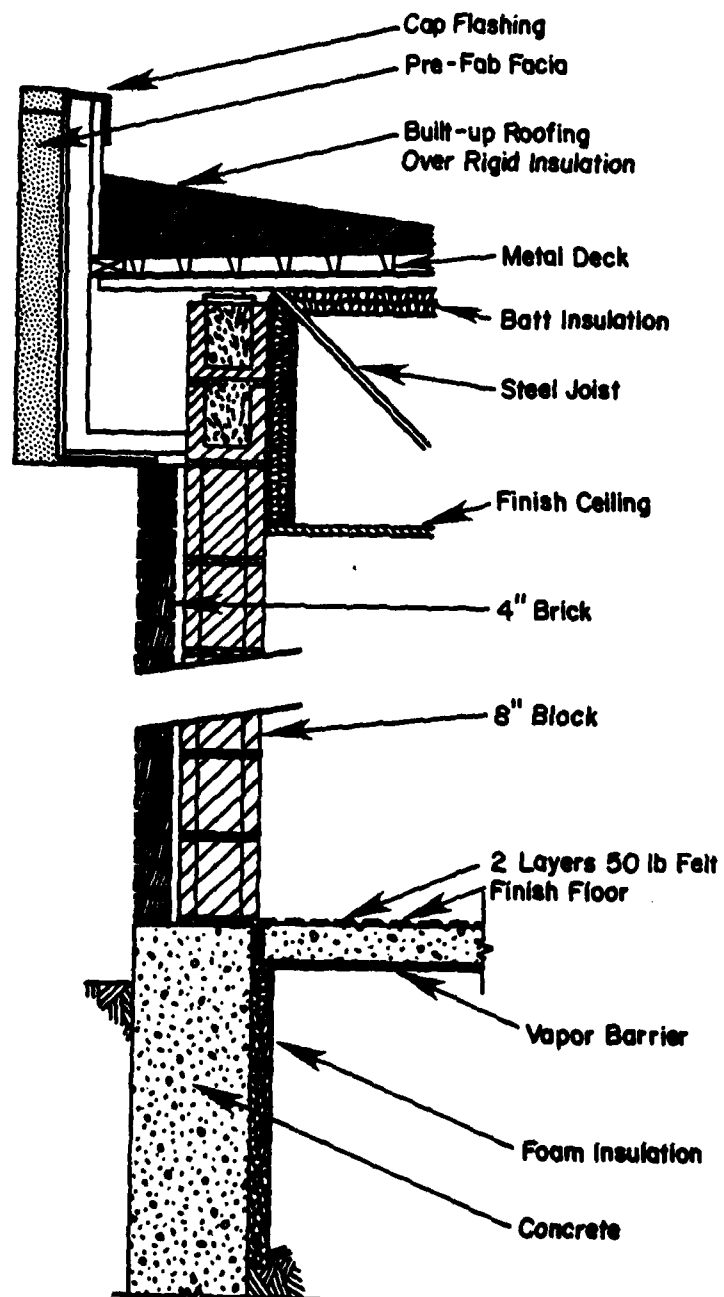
Battalion headquarters and classroom wall, floor, and ceiling details.
